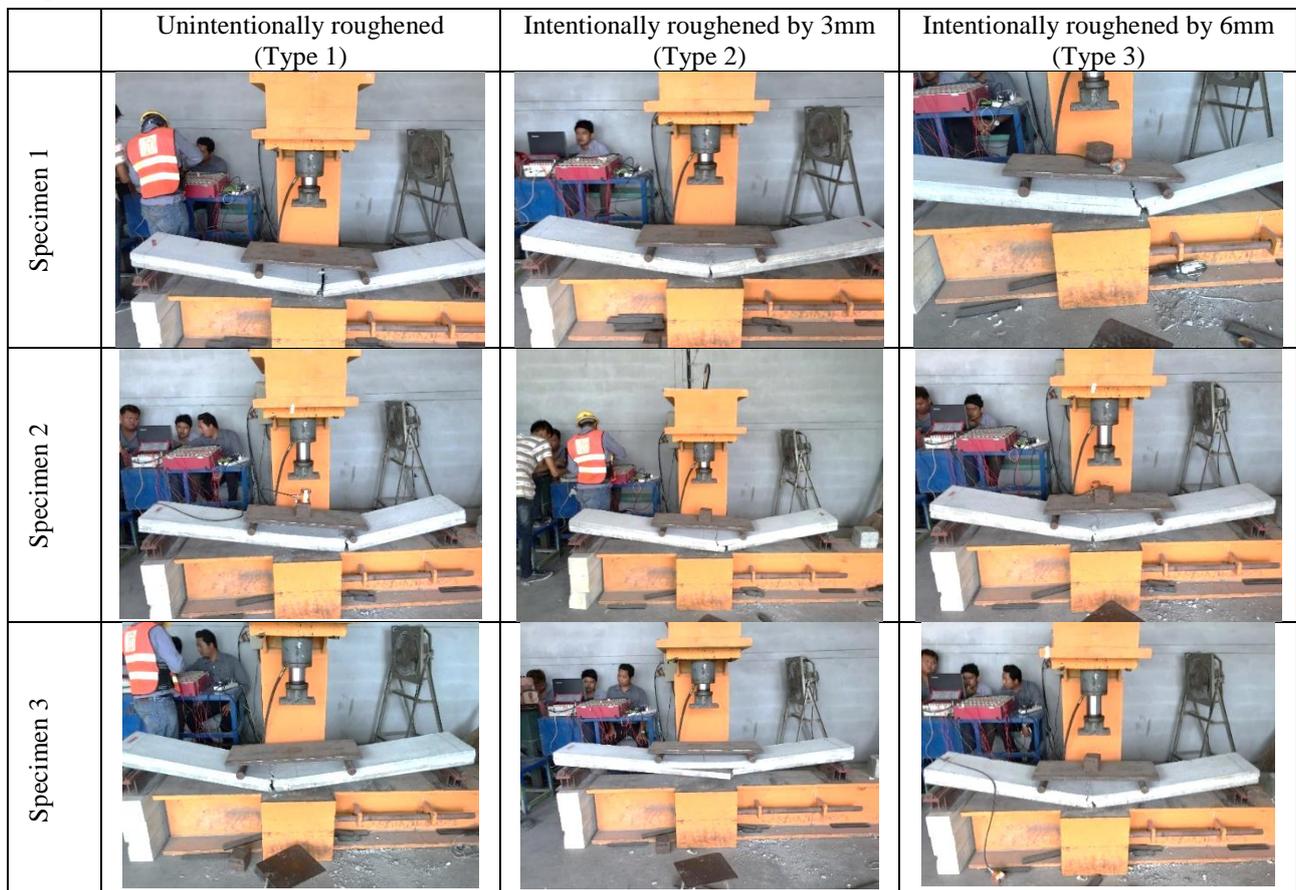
Characteristics of the concrete slab composites at their points of failure.
